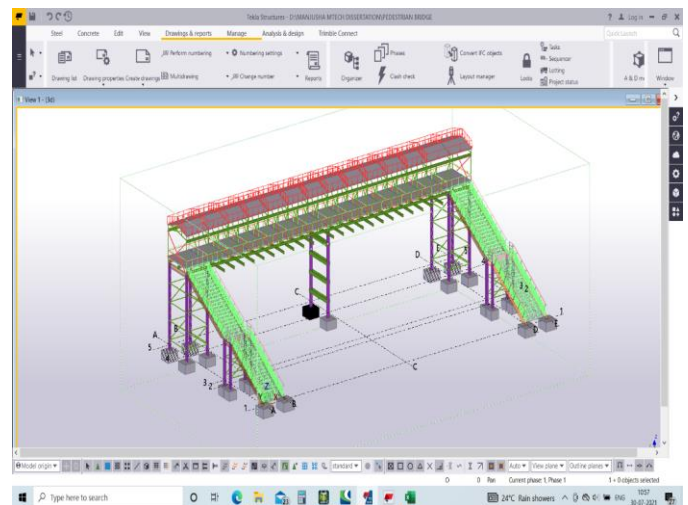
Modeling of Cold Formed Steel Bridge in Tekla Str.
